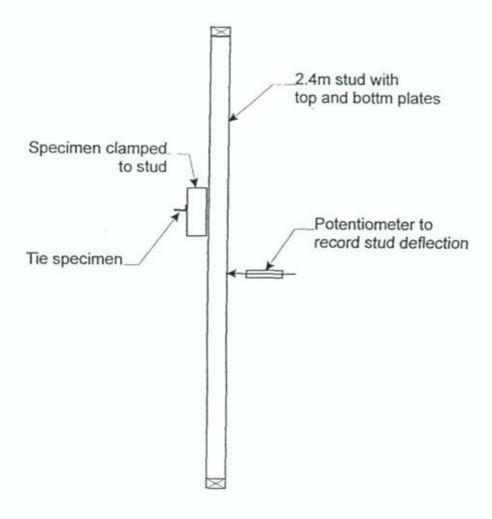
Series 5 tie tests. Set-up for installation of tie fixing
